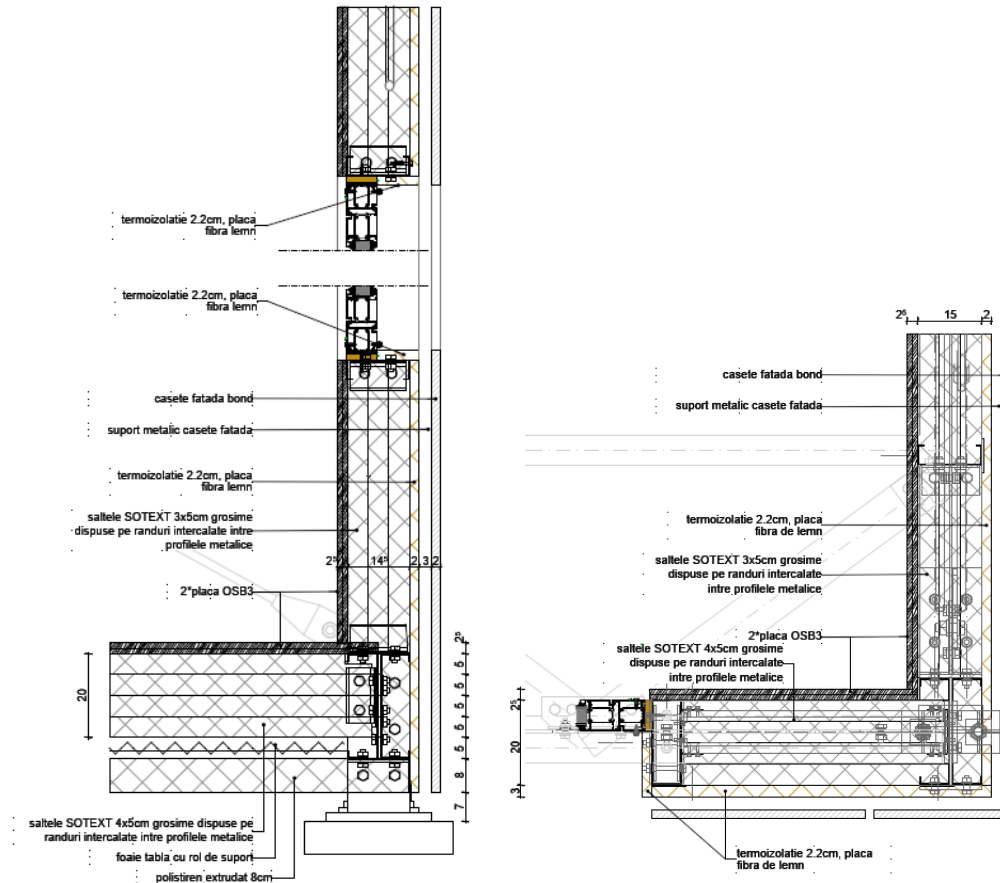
Construction detail – Left: Vertical section. Wall and bottom slab layer elements. Right: Horizontal section
